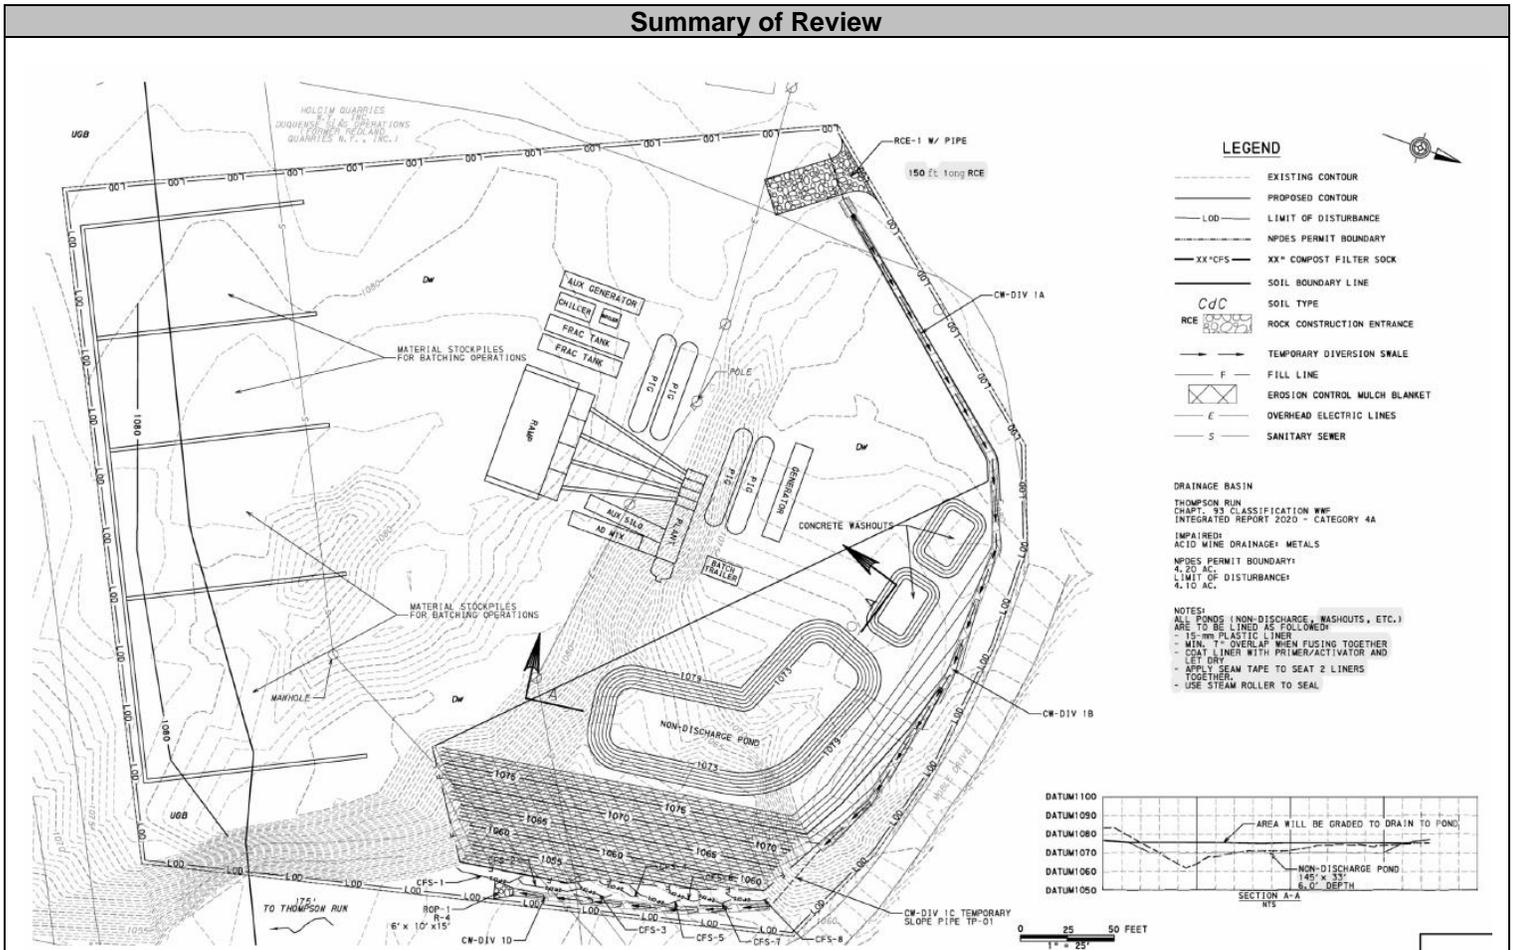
Proposed Details of GTC Concrete Batch Plant on Holcim's Duquesne Slag Plant
